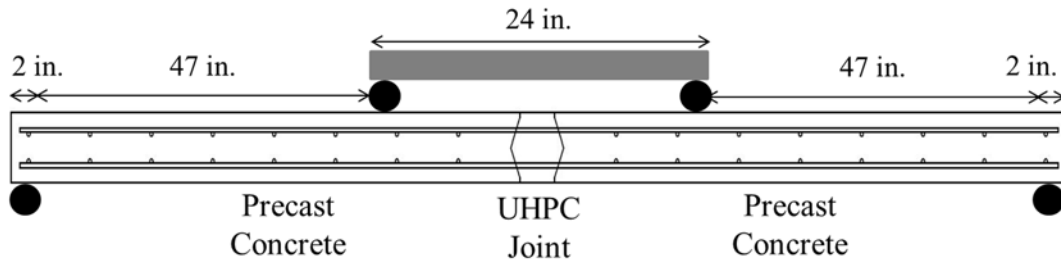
Four Point Bending Test Set Up for Flexure Test for Specimens F-100-1P-1, F-100-1P-2, F-100-2P-1 and F-100-2P-2
